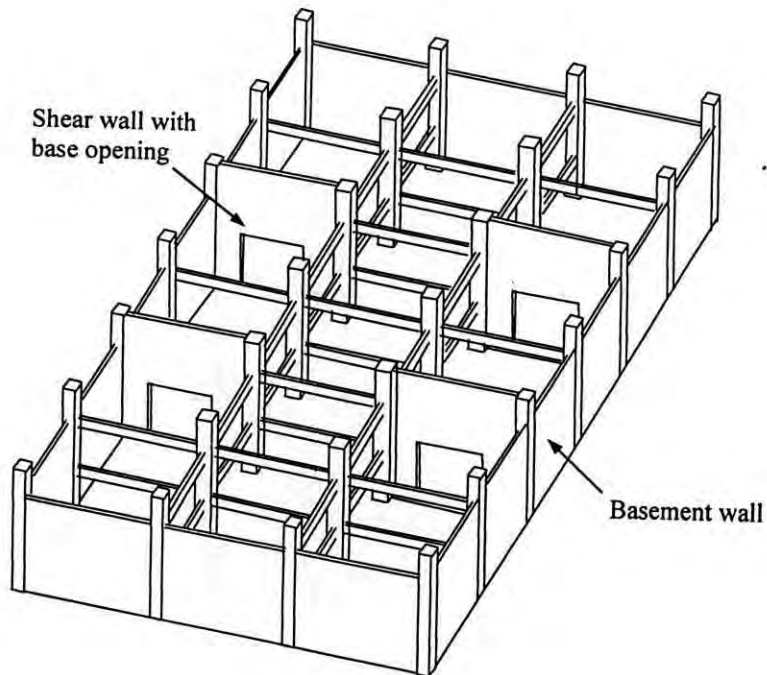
Partial View of the Type-5 (Frame + Shear Wall +Base Opening+ Basement Wall).
